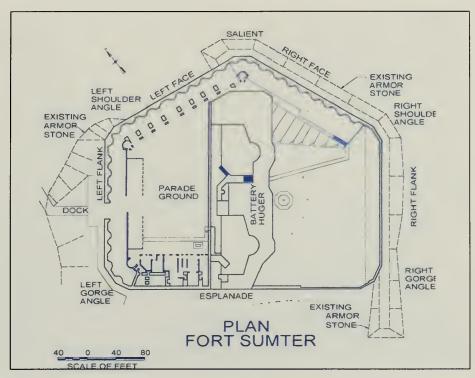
Plan of Fort Sumter, Armor Stone and Outer Wall Structural Study, 1998
